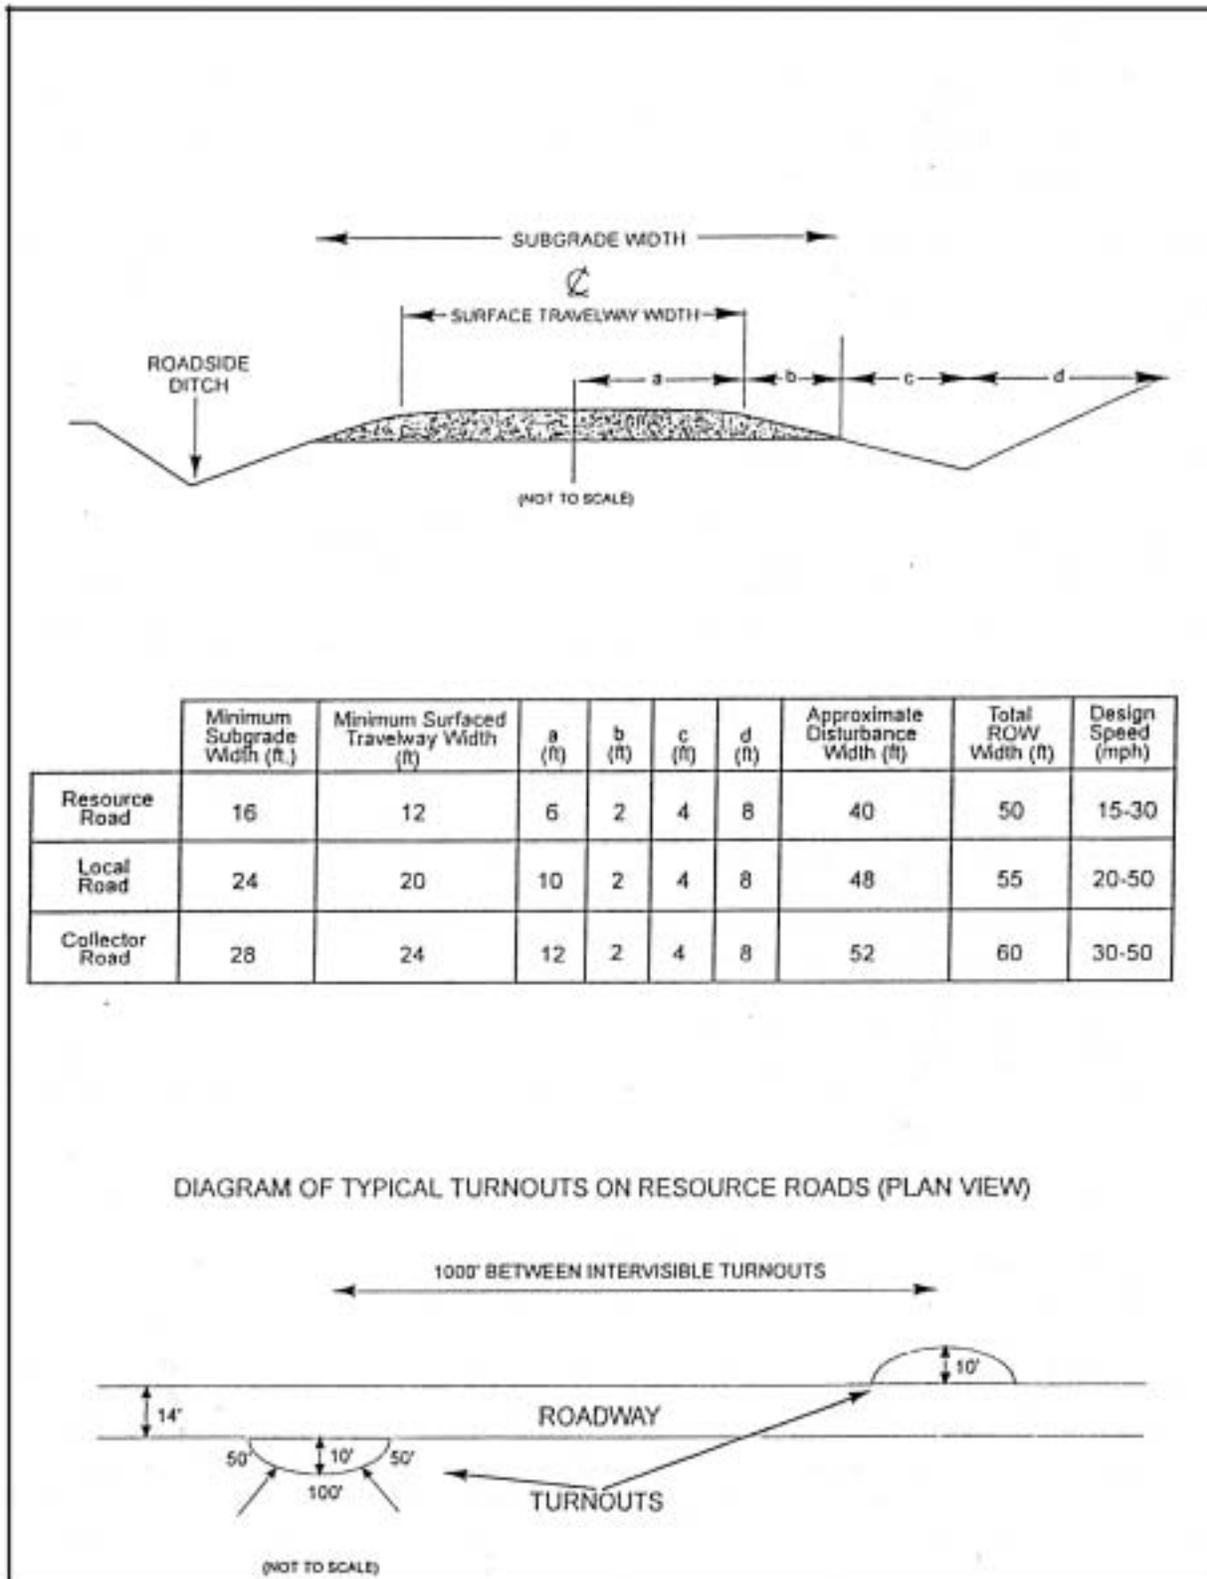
Typical Roadway Cross-Section with Width Specifications.
